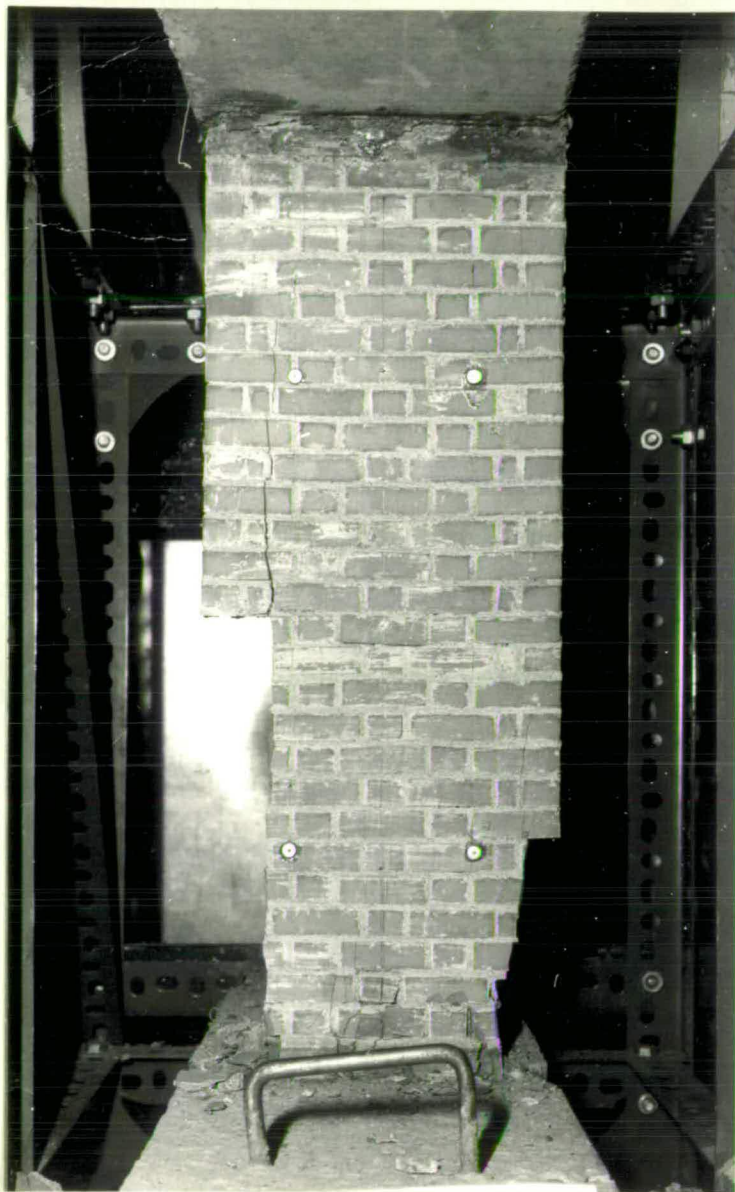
Typical failure by vertical splitting of wall (Flemish bond)
